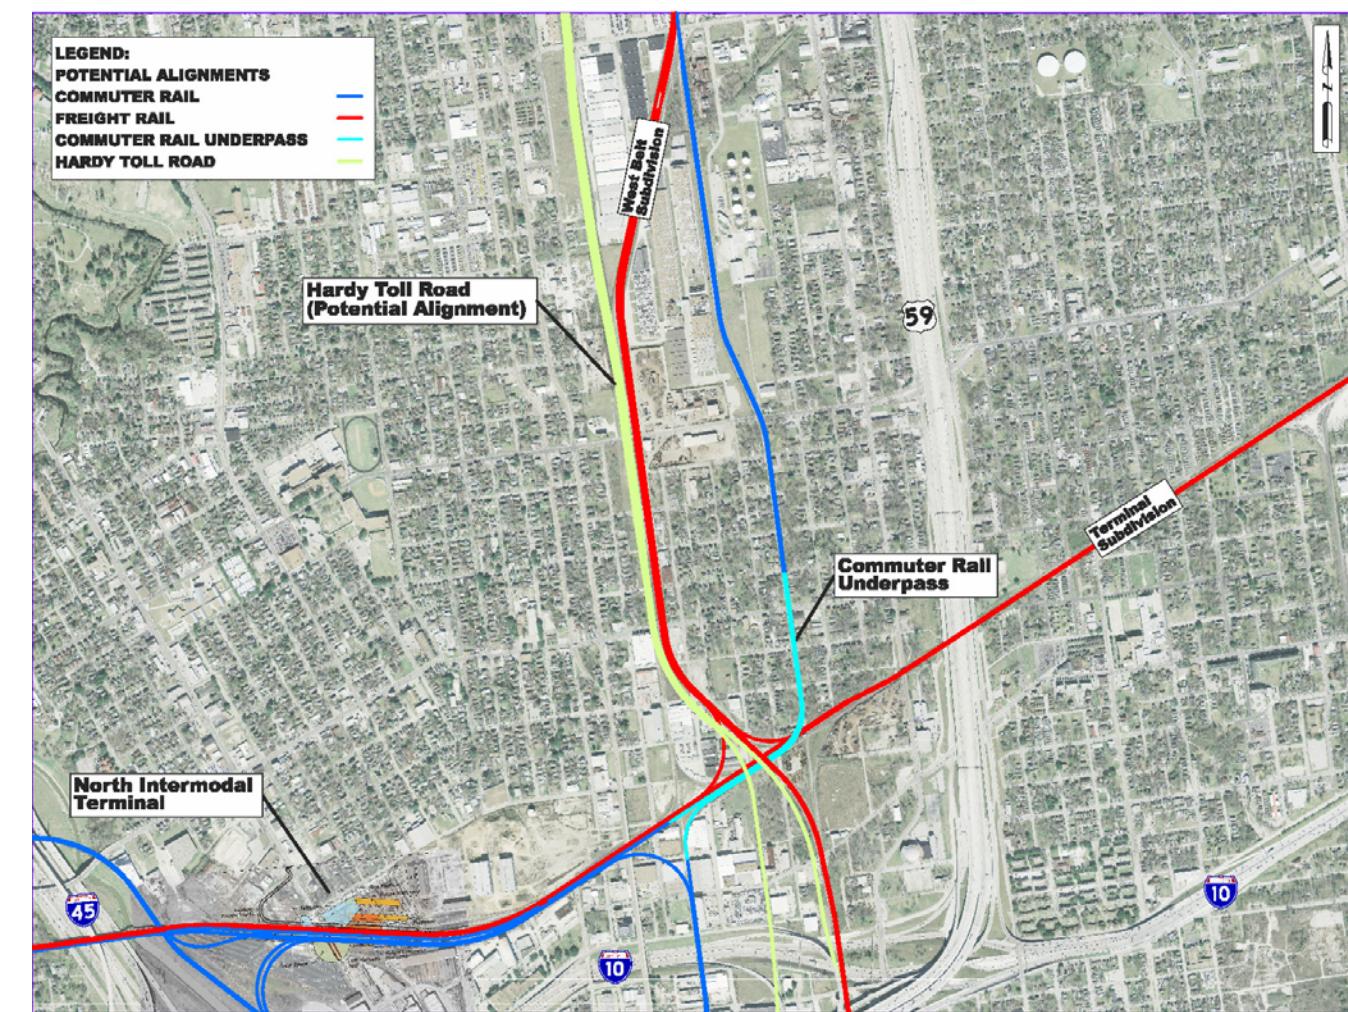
Potential Commuter Rail Grade Separation at Tower 26
